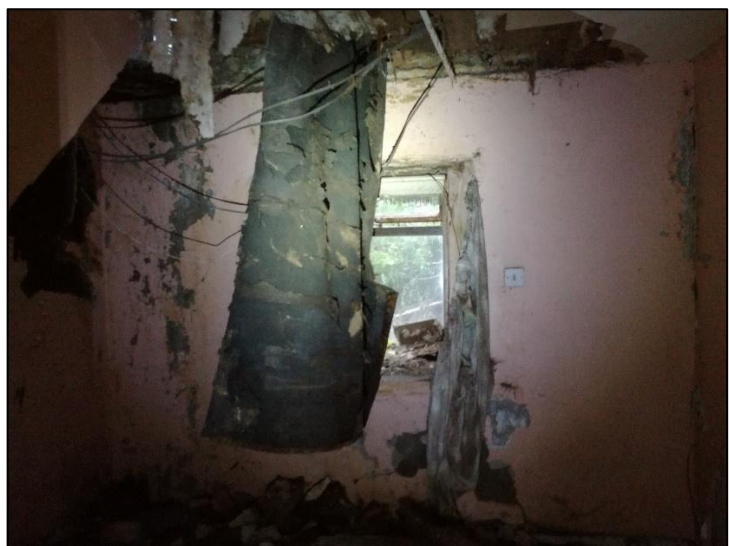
EXAMPLE OF DAMAGE AND UNSAFE CONDITIONS WITHIN EXISTING BUILDINGS ON-SITE.
